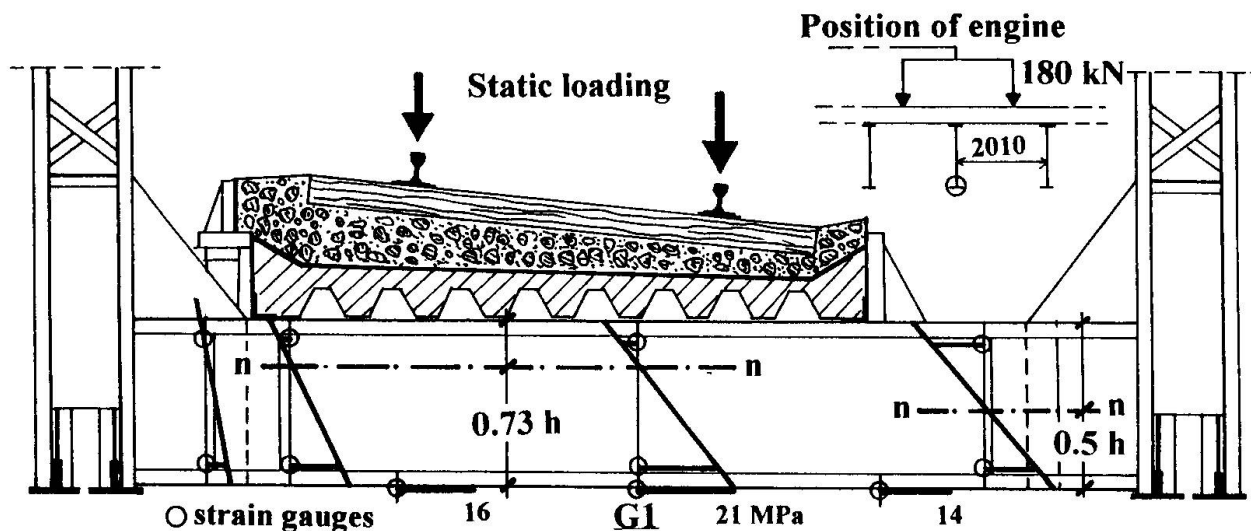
Structural performance of the cross girder: in-situ measurement under static engine load.
